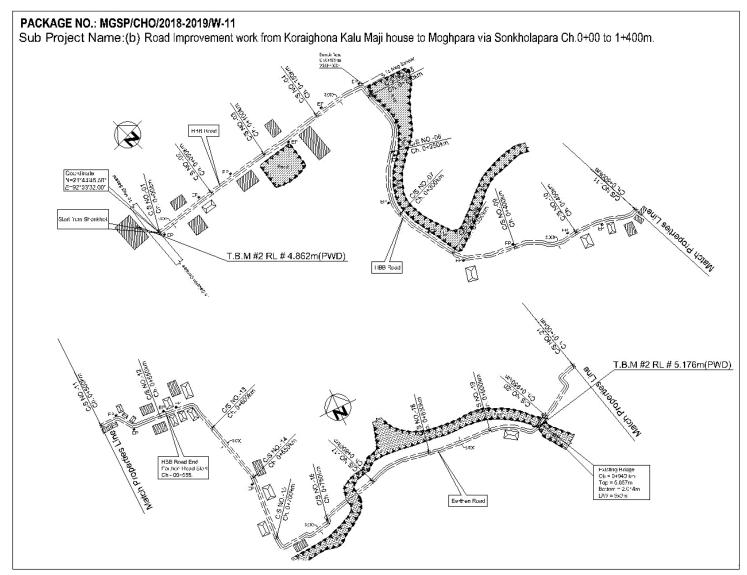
(b): Layout Plan of the proposed Subproject Road from Koraighona Kalu Maji house to Moghpara via Sonkholapara
